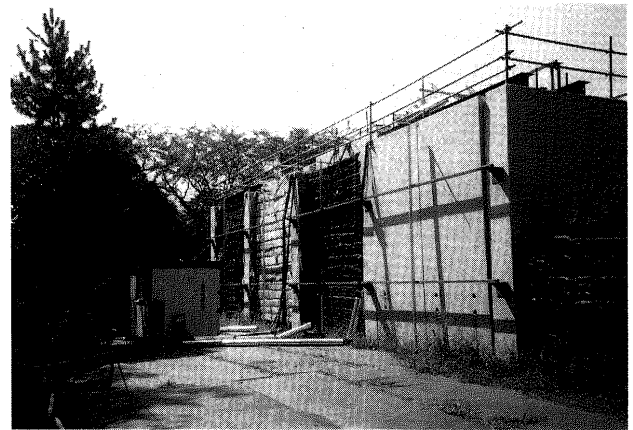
View of the walls (from the right, the walls 4N, 3N, 2N and 1N)
